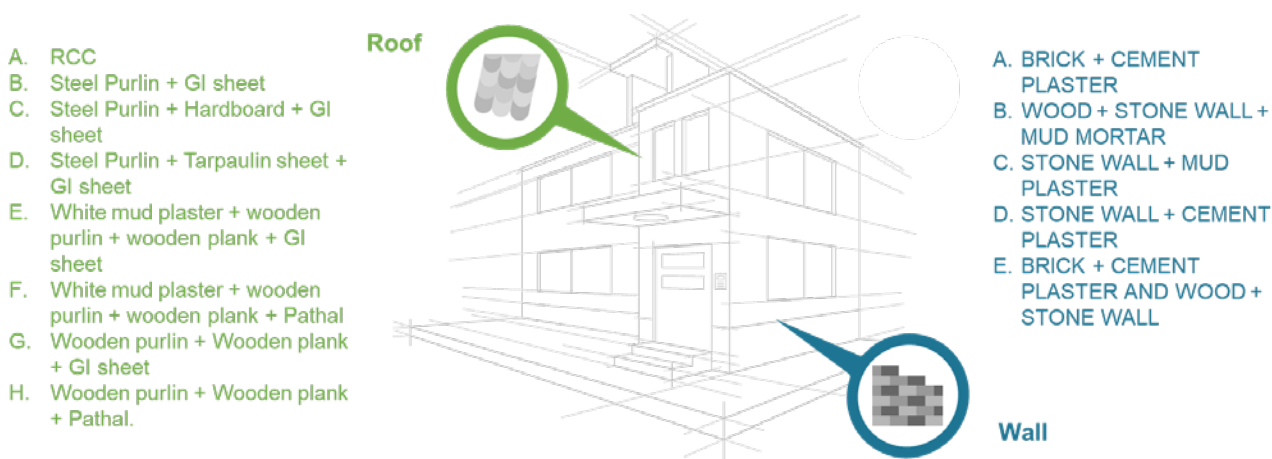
Roof and Wall assemblies of Residential Buildings
